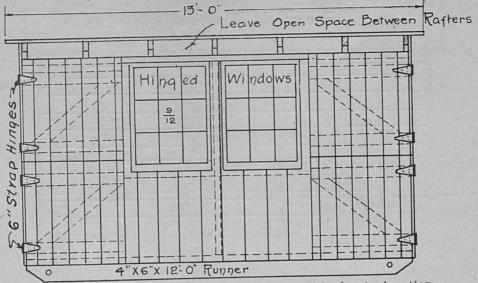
Two Pen Hog House Plan C 6-74-1, front elevation.
